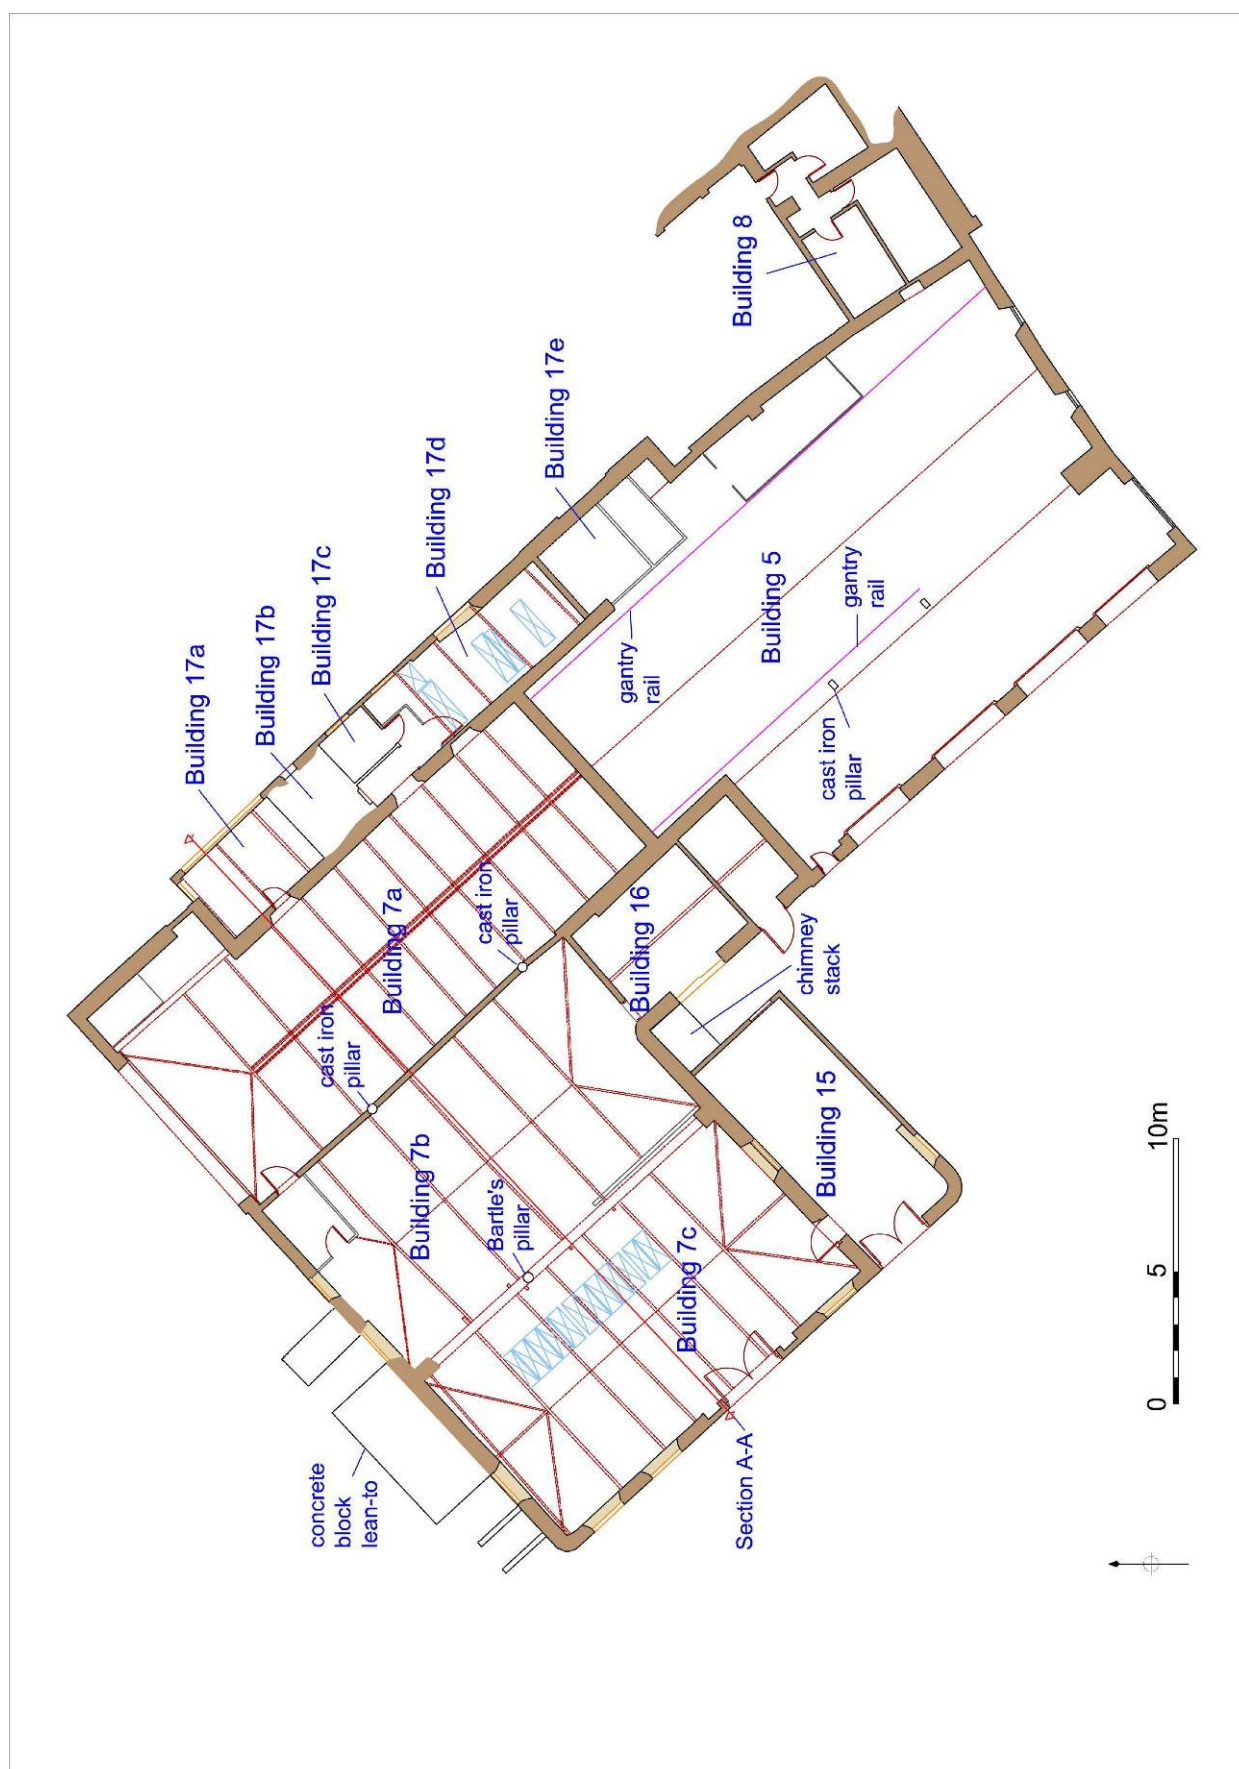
Plan of buildings 5, 7, 8, 15, 16 and 17
